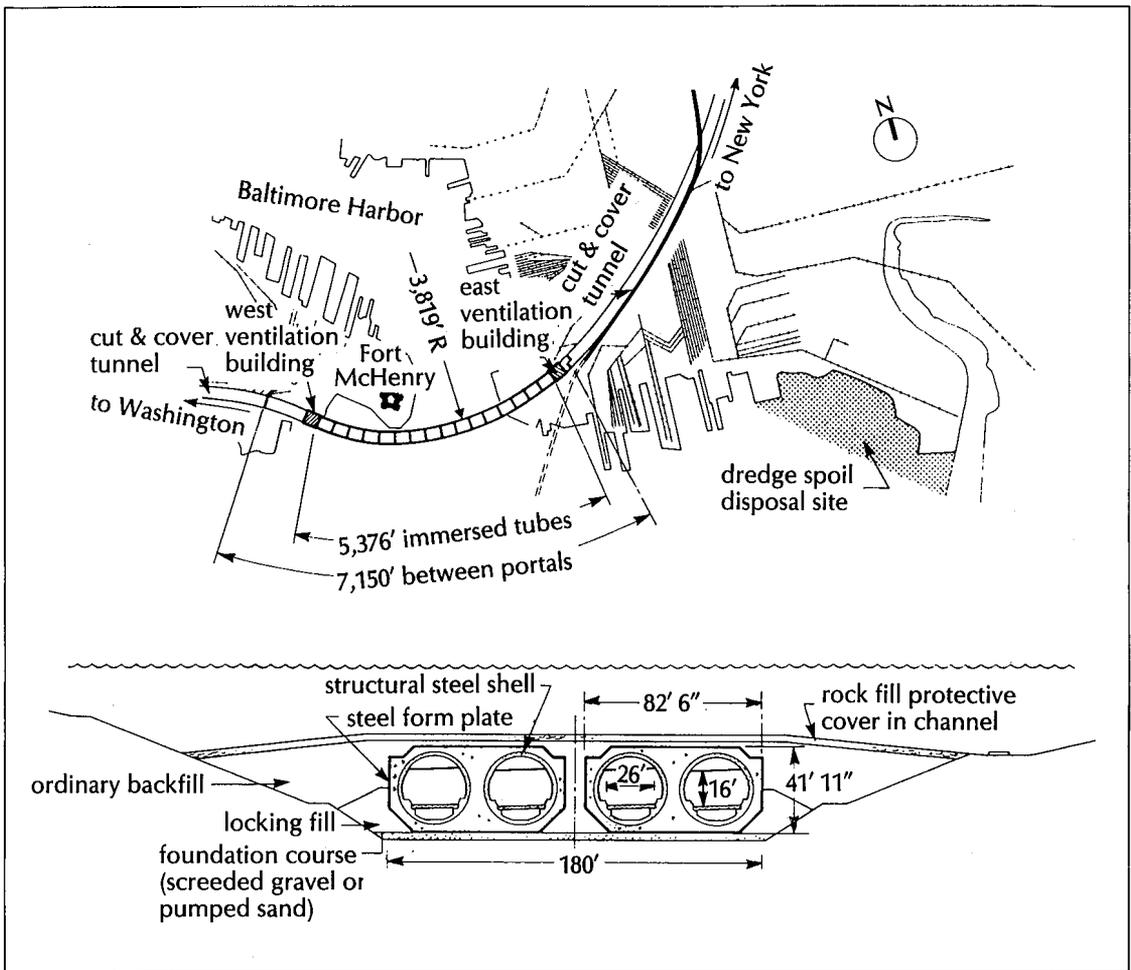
Plan and section of the Fort McHenry Tunnel.
